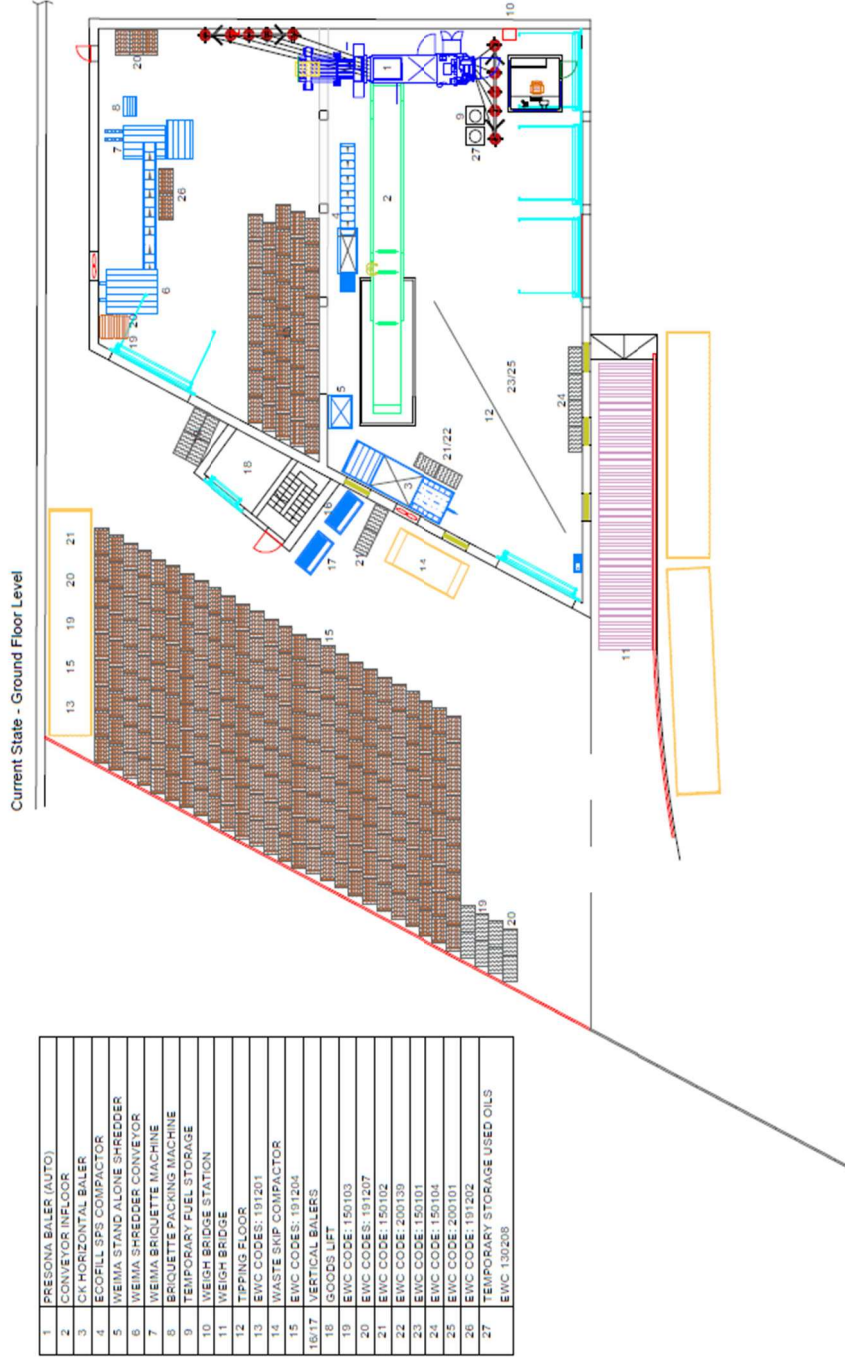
Site layout of the permitted installation to undertake the specified operations. The extent of the site is indicative and shall not be used for interpretation purposes
